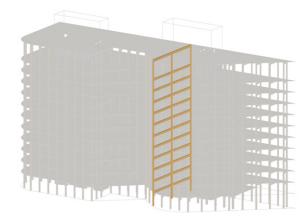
| SMTT | Typical Beam & Column Bay
